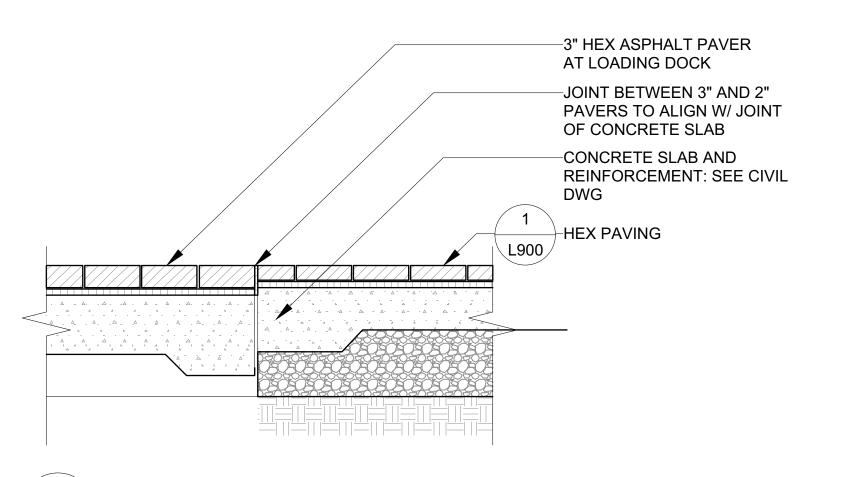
DETAILS - PAVING TRANSITIONS AND DRAINS
